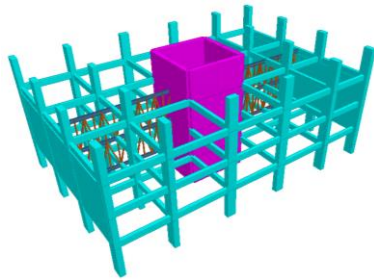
3D view of 30th floor Offset Outrigger with belt truss system
